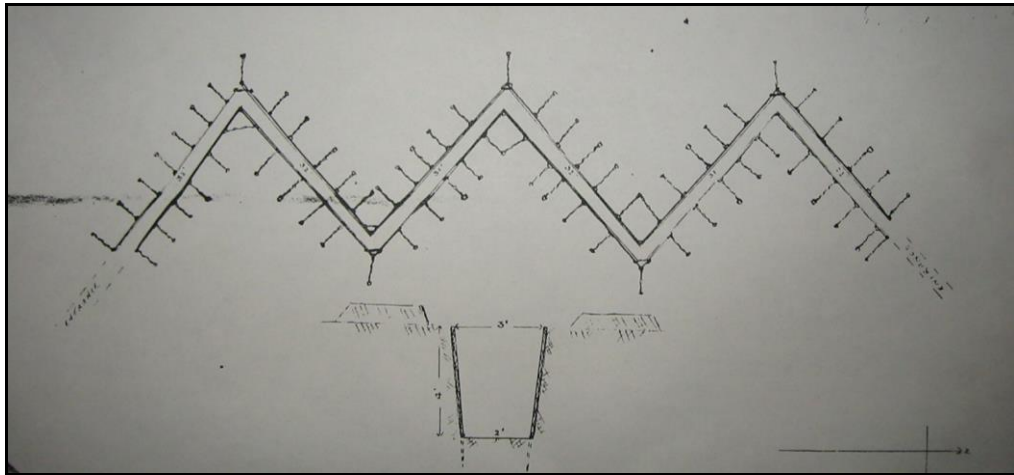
Plan and elevation for a zigzag trench, Glenelg foreshore, April 1942 (Glenelg Air Raid Shelter Interpretive Centre)
